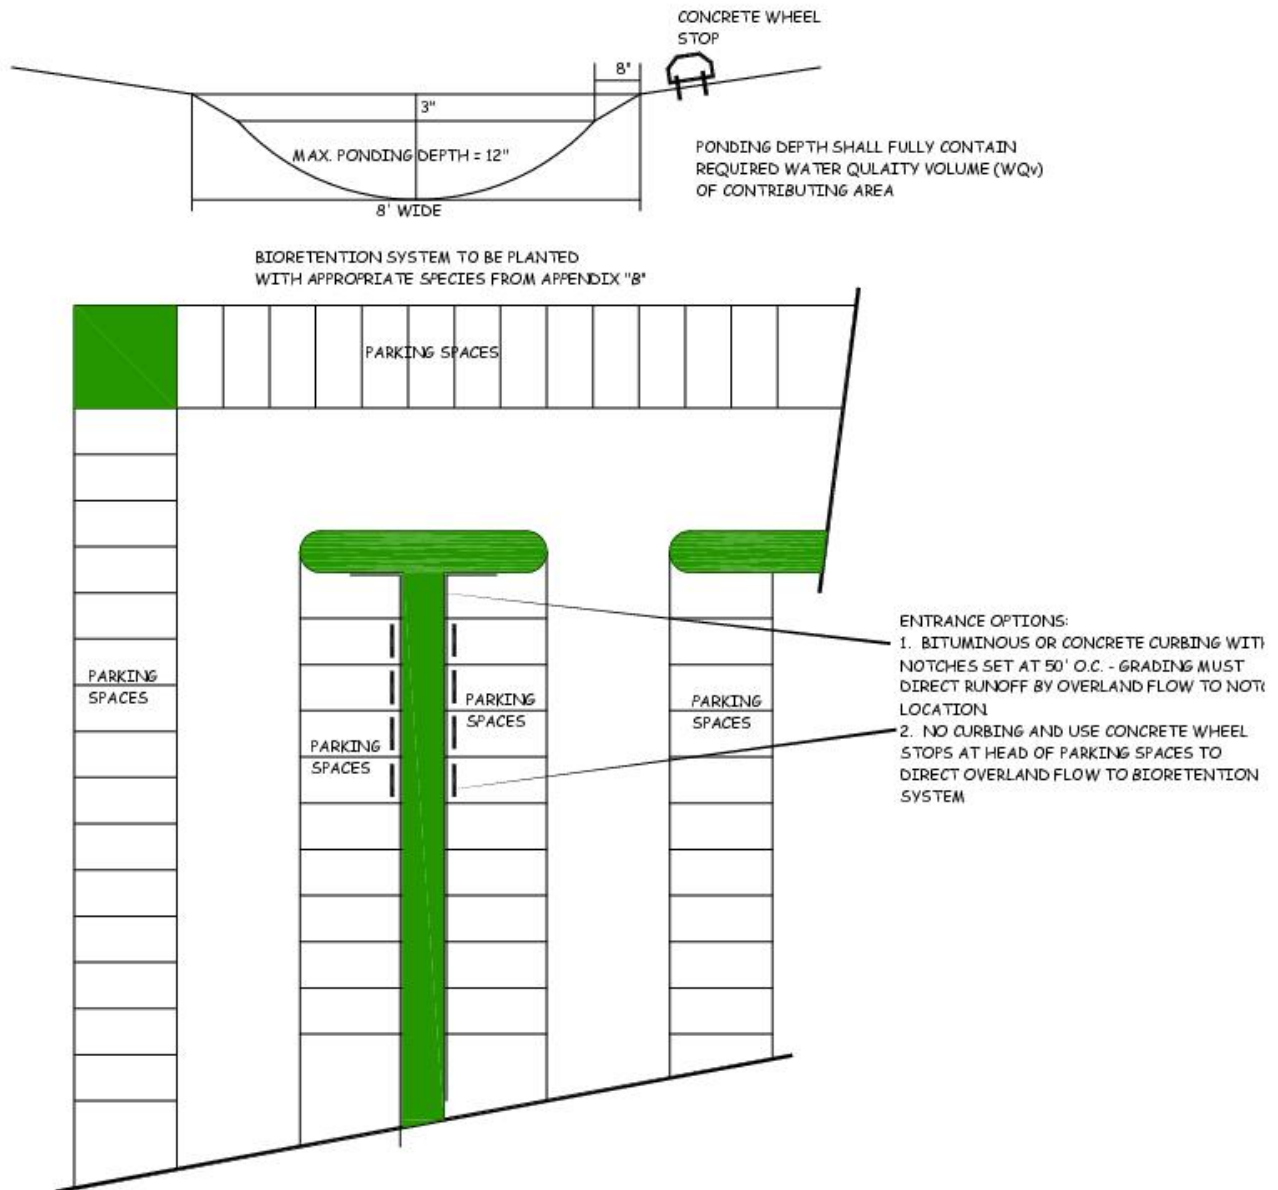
c – Bioretention in Parking Islands (Trinkaus Engineering, LLC)
